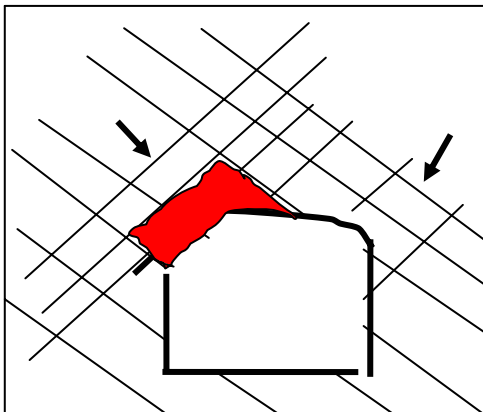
(a) Typical sliding failure in In Quartzite haulage
